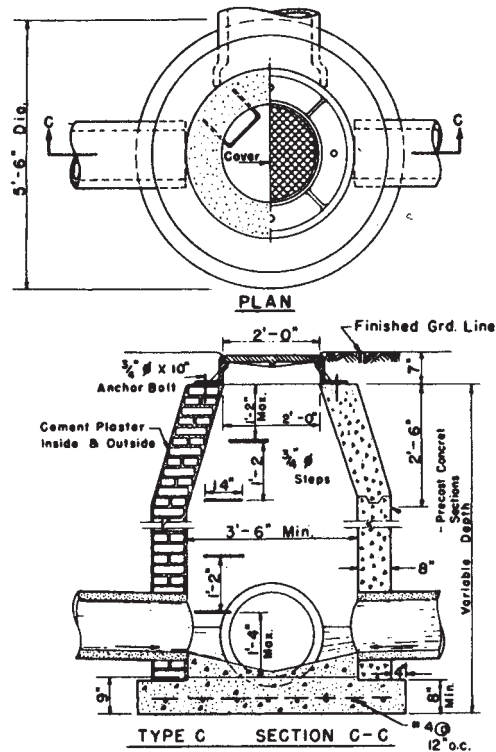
Suggested manhole design (adapted from Ref. 1).
